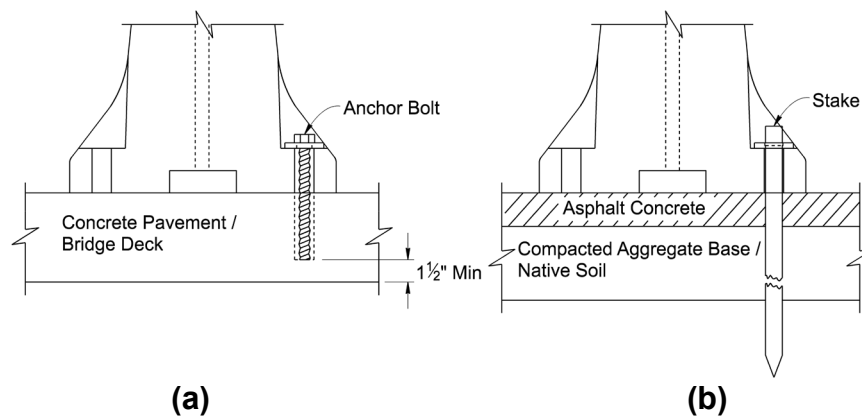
Illustration for (a) Anchored (b) Staked
